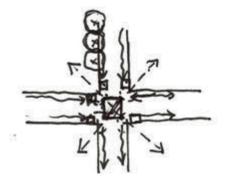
(left) Collecting surface runoff at existing gutter inlets
